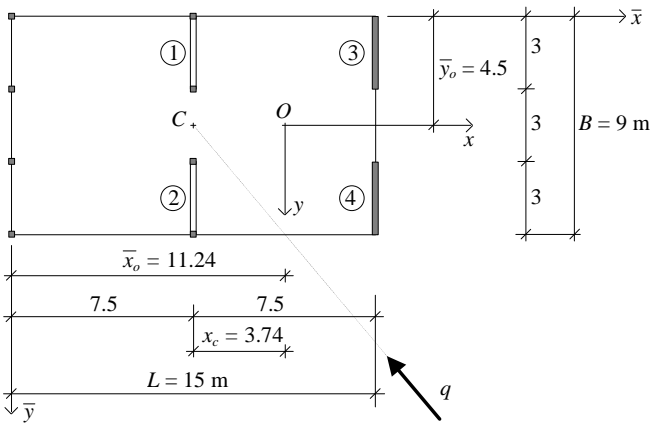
Case 1: An unacceptable bracing arrangement.
